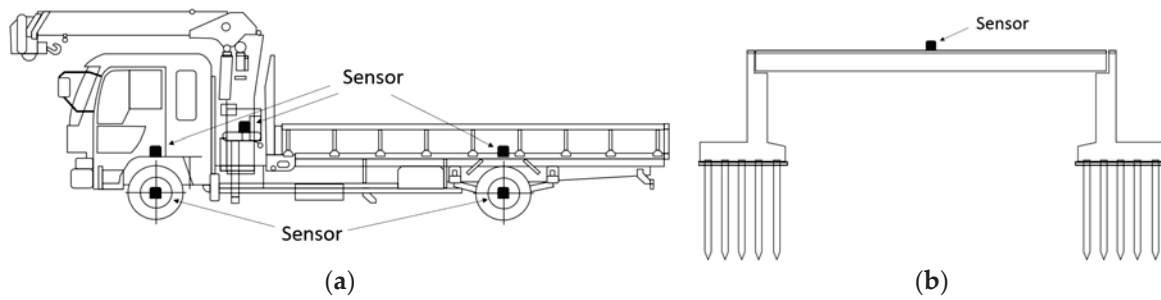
Layout of sensor installation: (a) vehicle; (b) bridge.
